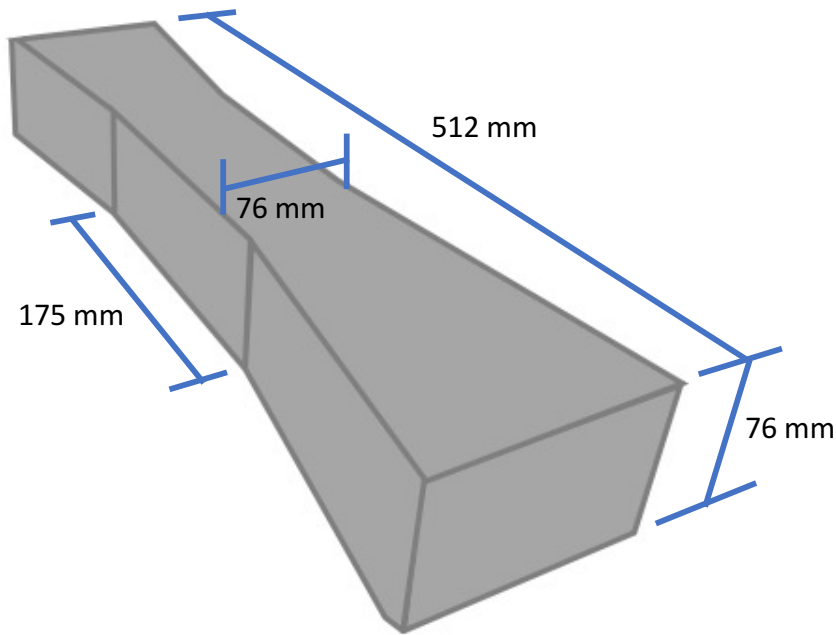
The large dogbone shaped specimens have a gage section cross-section approximately 76 x 76 mm, and gage length of ~ 175 mm
